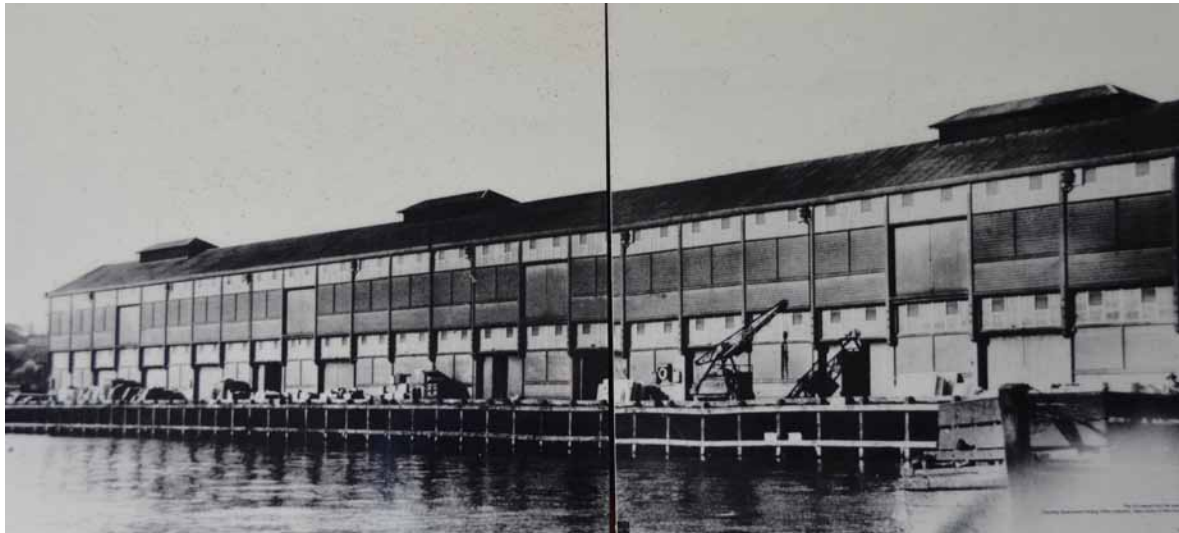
West side of Pier 2/3, c 1930s. Photo shows former openings on first floor. Potential to reinstate openings on the west side of Pier 2/3 in the location of original openings.
